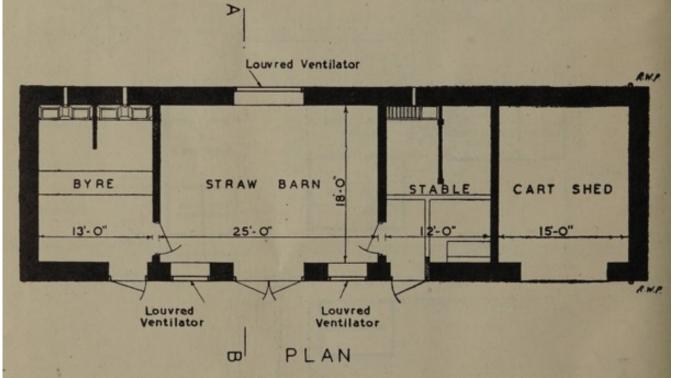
Plan Q. Highland Croft Steading for 5 to 10 Acres (See paragraph 66)
